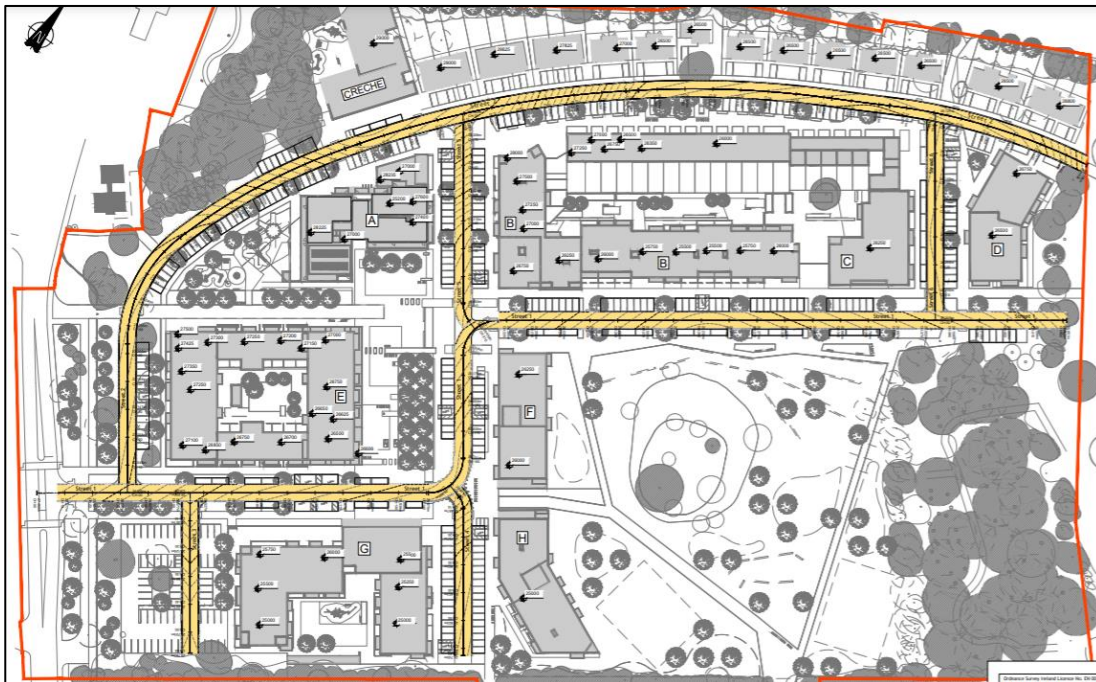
Proposed Road Layout Plan – Shanganagh Castle Residential Development © Dun Laoghaire-Rathdown County Council 2020
